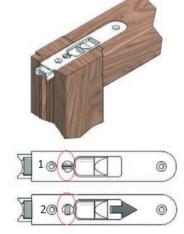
Sliding bolts of the bottom sash for a vertical sliding sash window:
